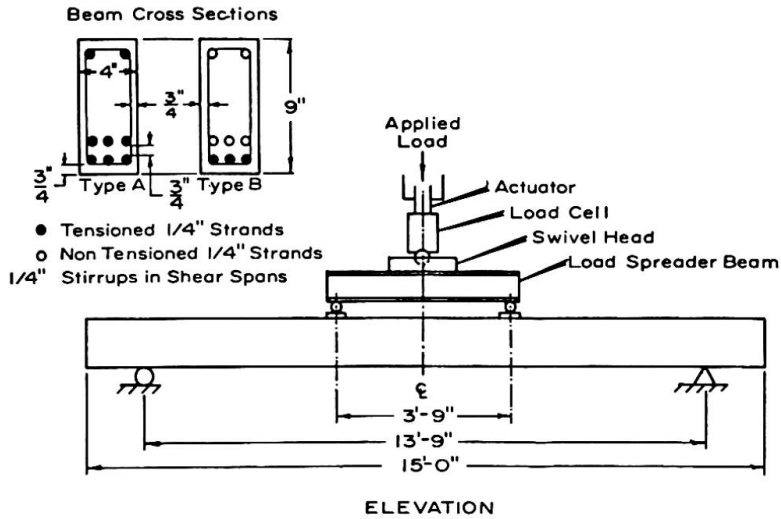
Cross Sections and Loading Arrangement for Test Beams
